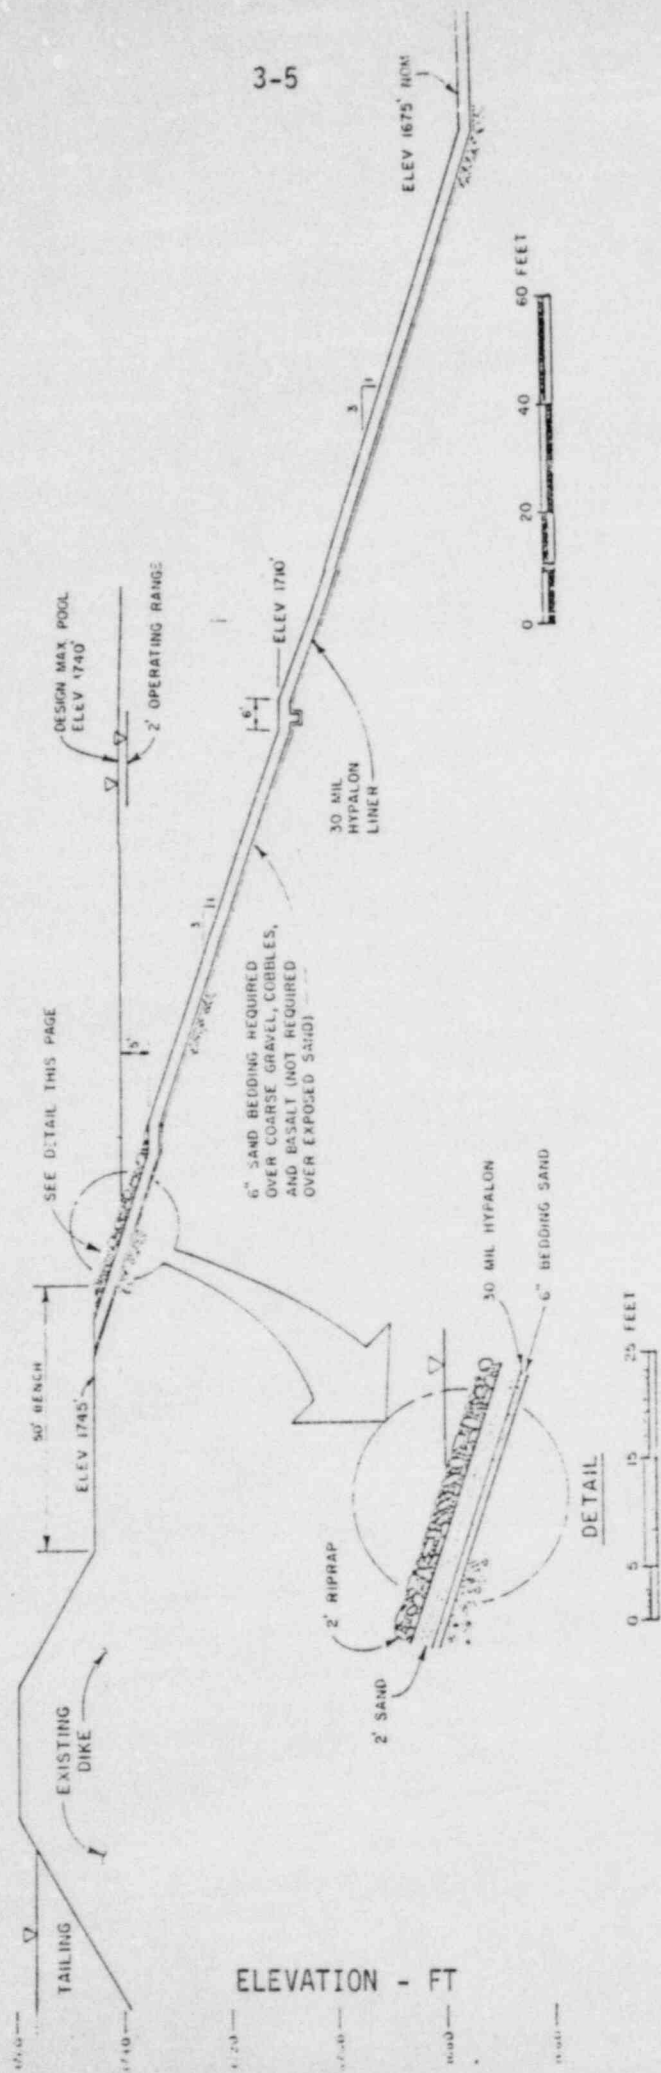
Typical Section of North Side of Pit (Source: Reference 3)
